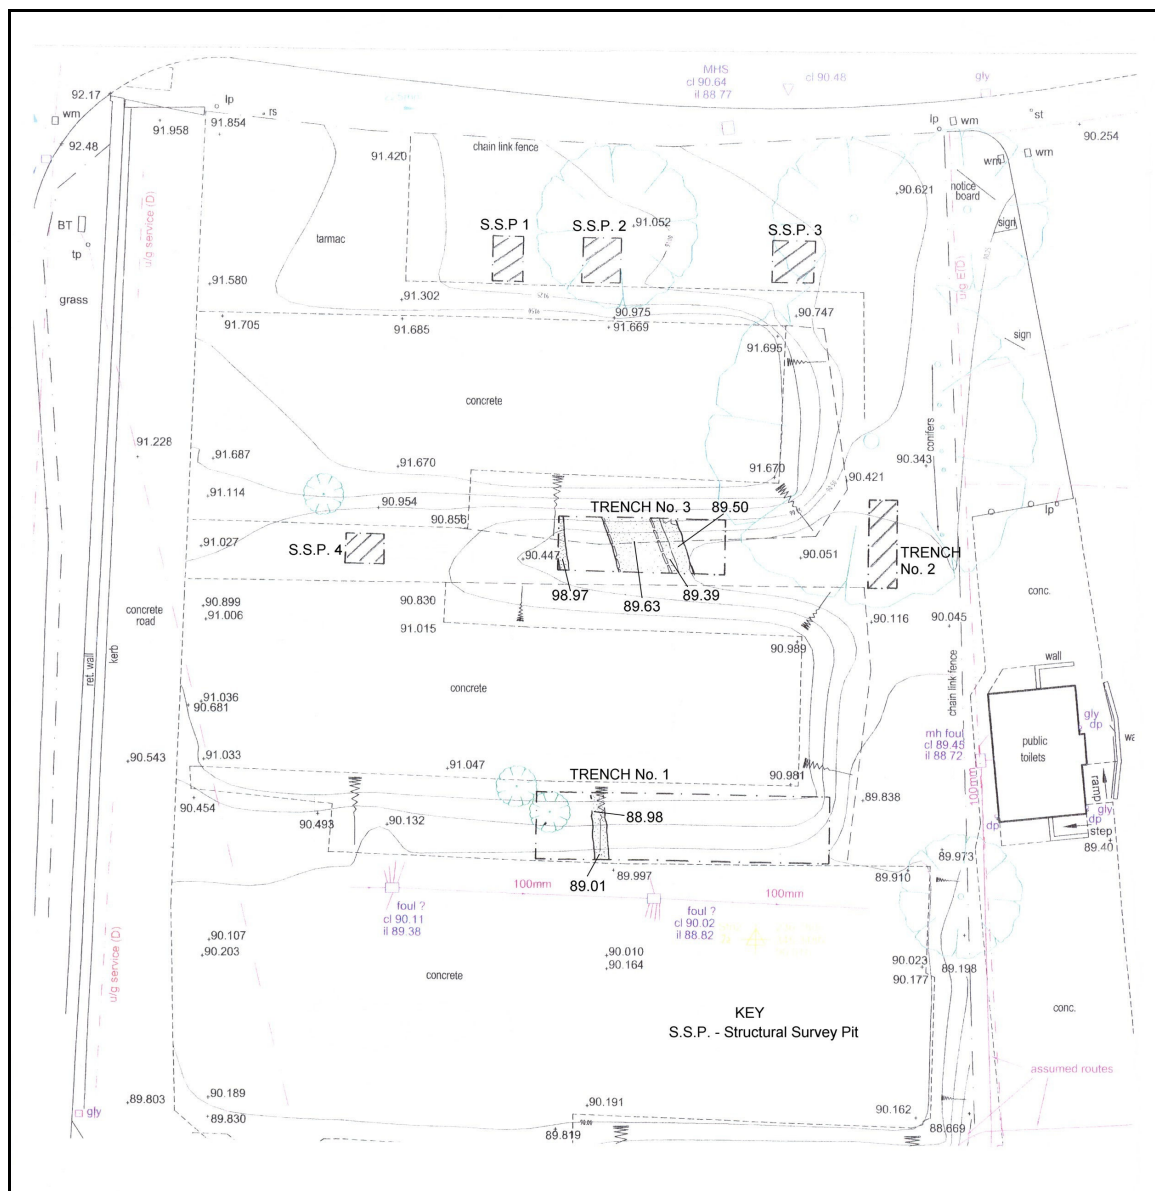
Trenches and structural survey pits plotted onto architects' plan
